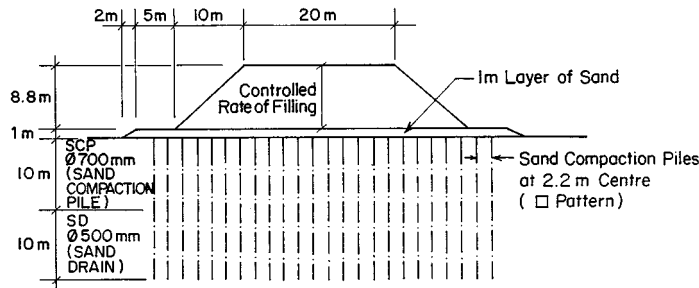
Embankment constructed on foundation stabilized with sand compaction piles
